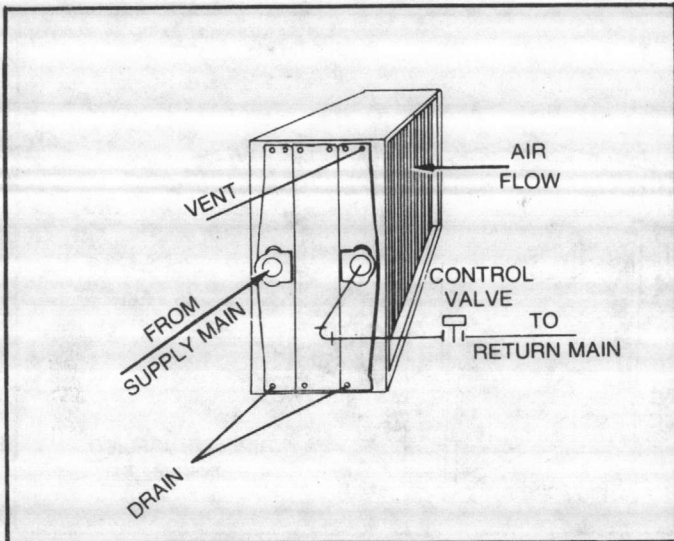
Typical Piping for Type DD Water Cooling Coil with Center Connections.
